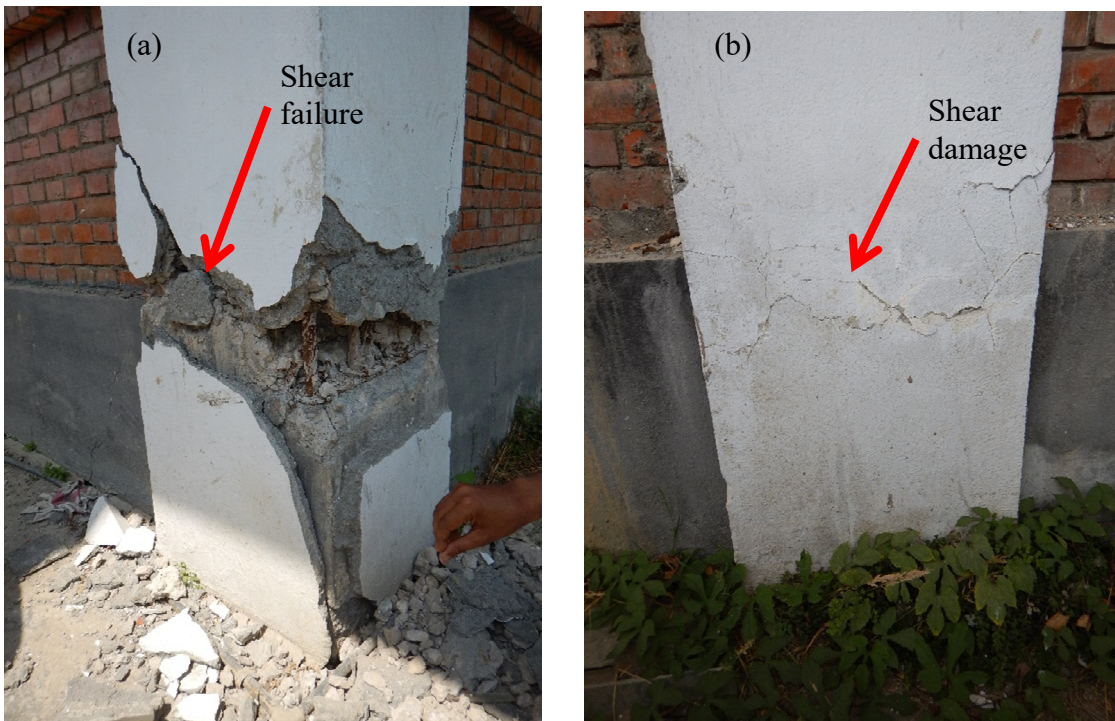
Central Fisheries Building – column base damage: (a) corner column; (b) exterior column.
